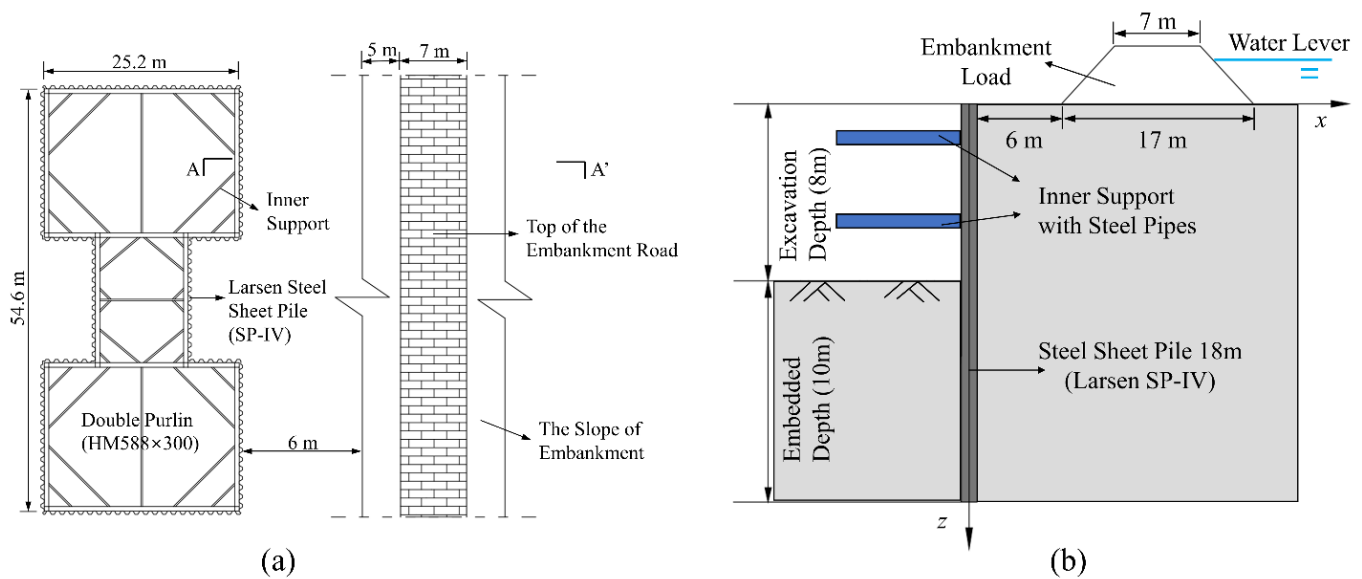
Relative spatial position of the foundation pit and the embankment in the case History 3: (a) relative plan layout of the steel cofferdam and the embankment; (b) A-A' cross-section profile.
